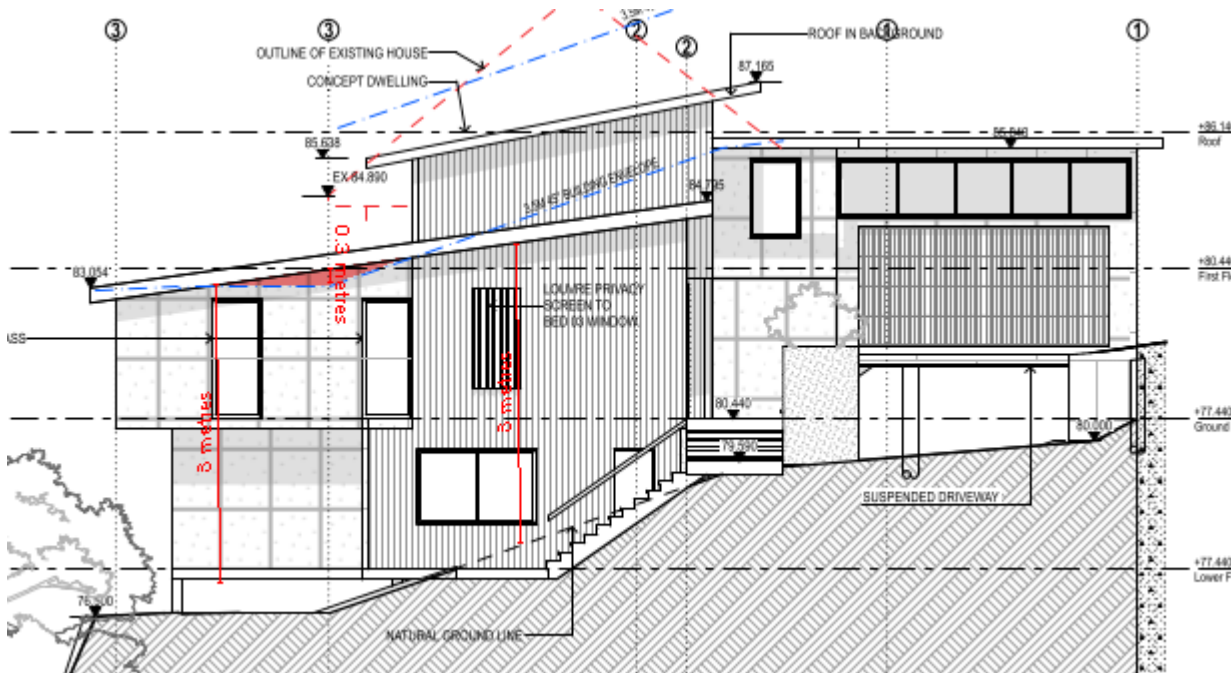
Southern elevation of the concept dwelling for lot 1 showing the building envelope breach in red.
